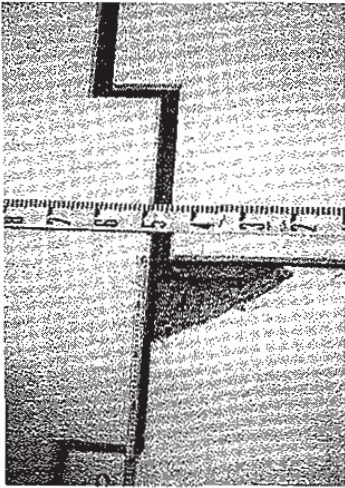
Example of separation of a concrete fragment at a corner of wall element
